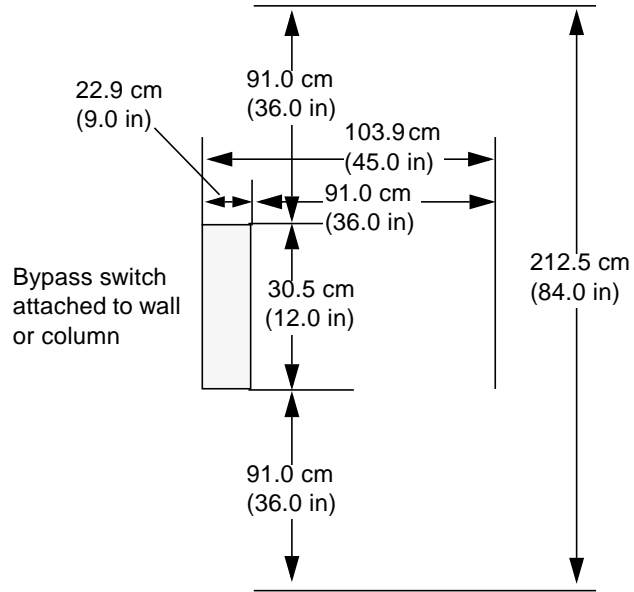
Bypass Switch With Dimensions, Top View
